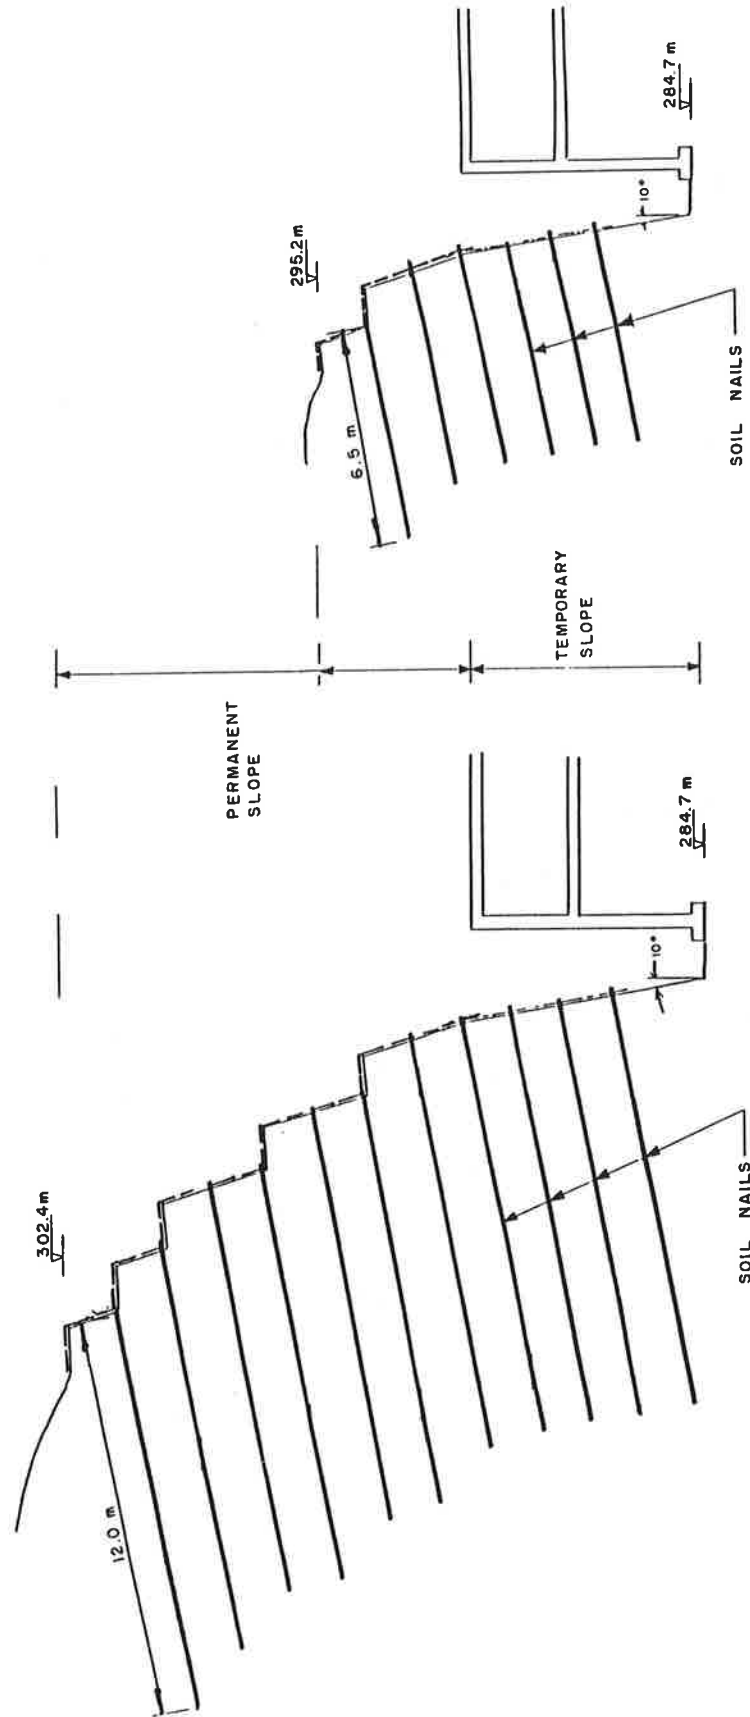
Typical cross sections through soil nail reinforced slope.
